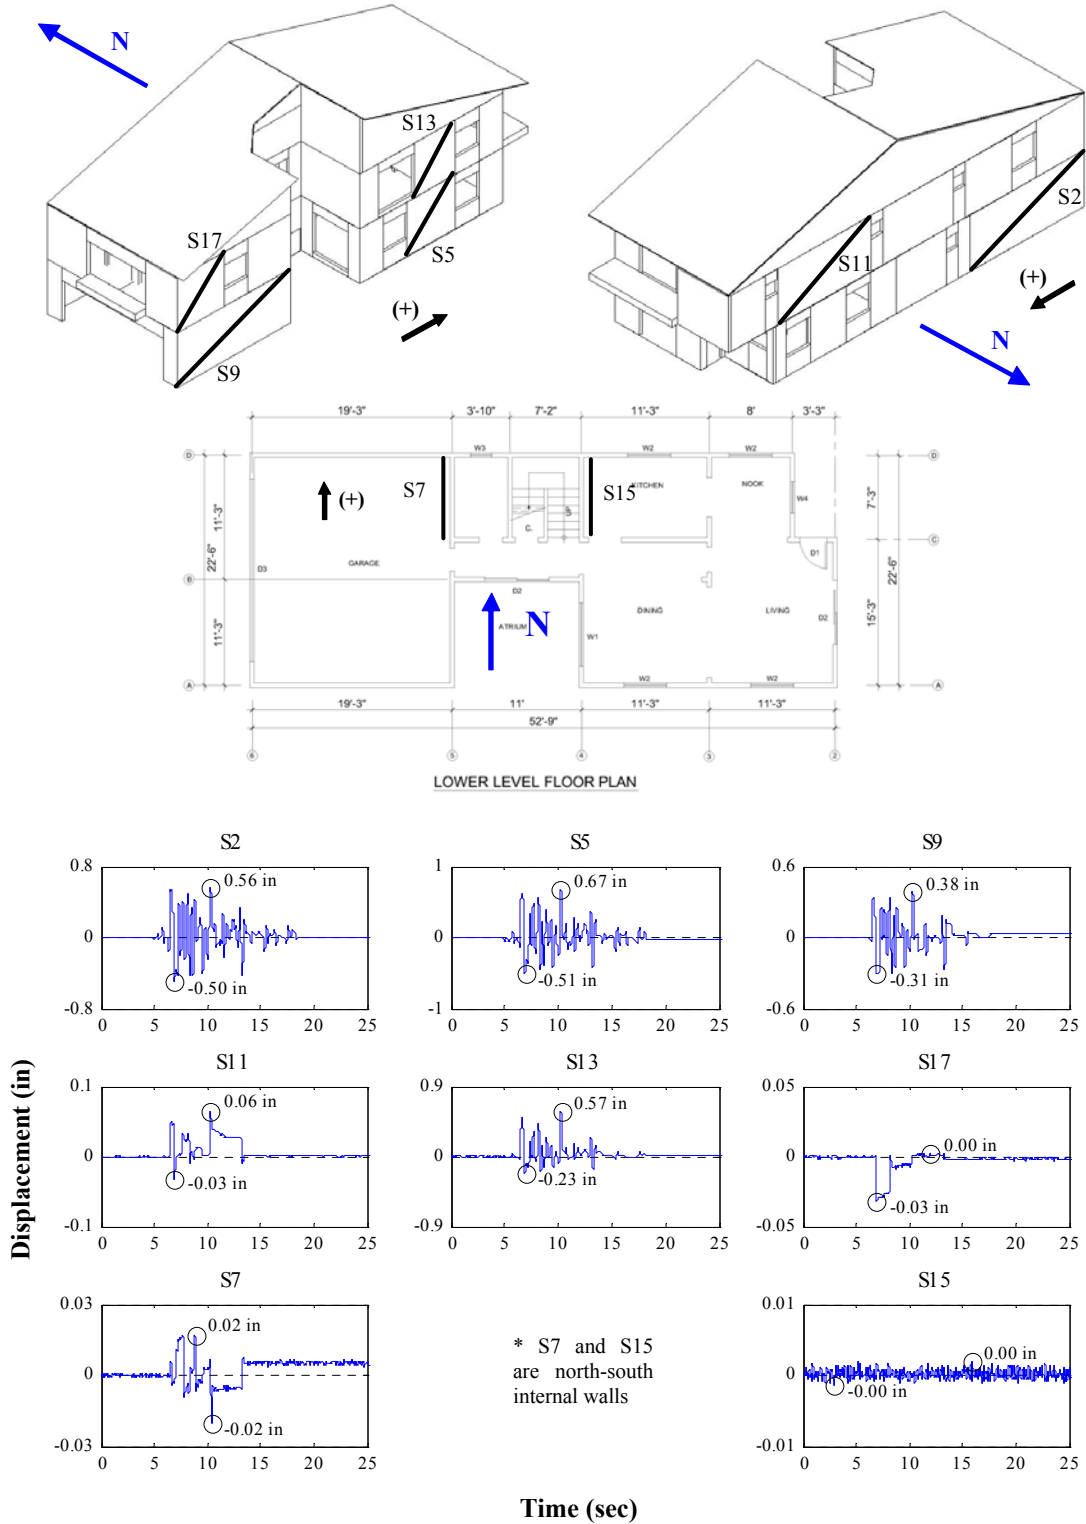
Wall deformations of east-west internal walls for Test NWP2S30
